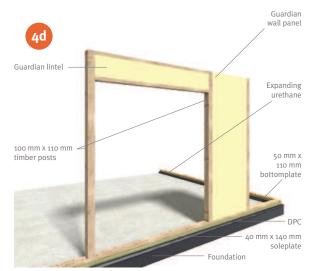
Beams or Lintels Above Window and Door Openings – Cross Section
